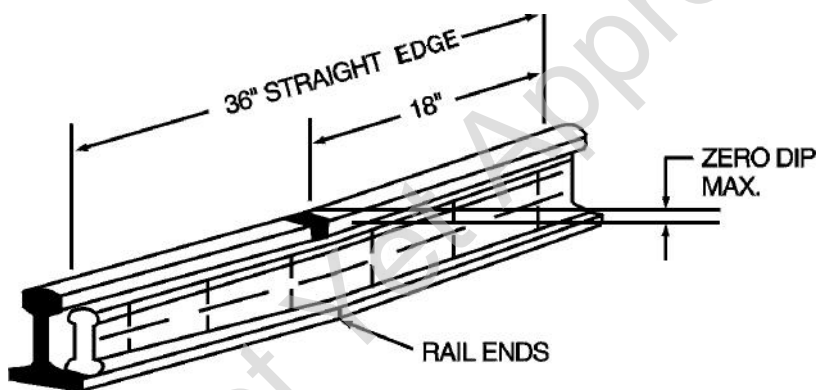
Elevation of Joint Showing Misalignment Tolerance in Vertical Alignment per Article 3.8.6.2
